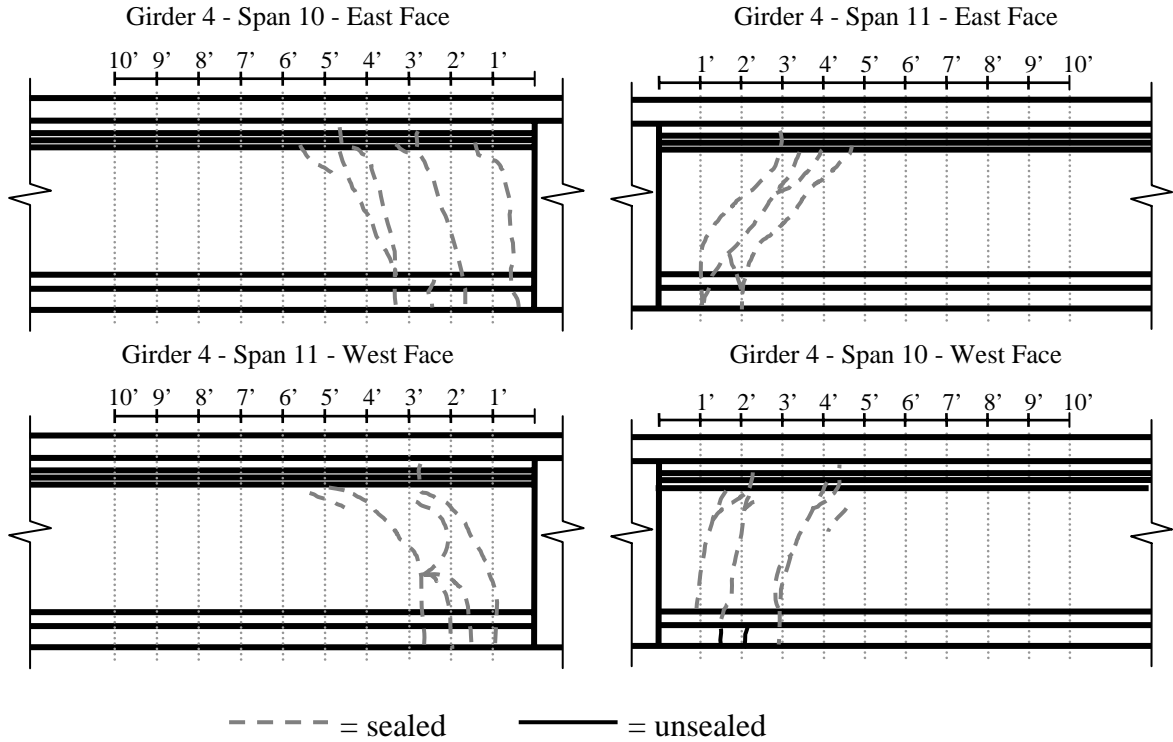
Girder Line 4 Cracking (Fason and Barnes 2004)
